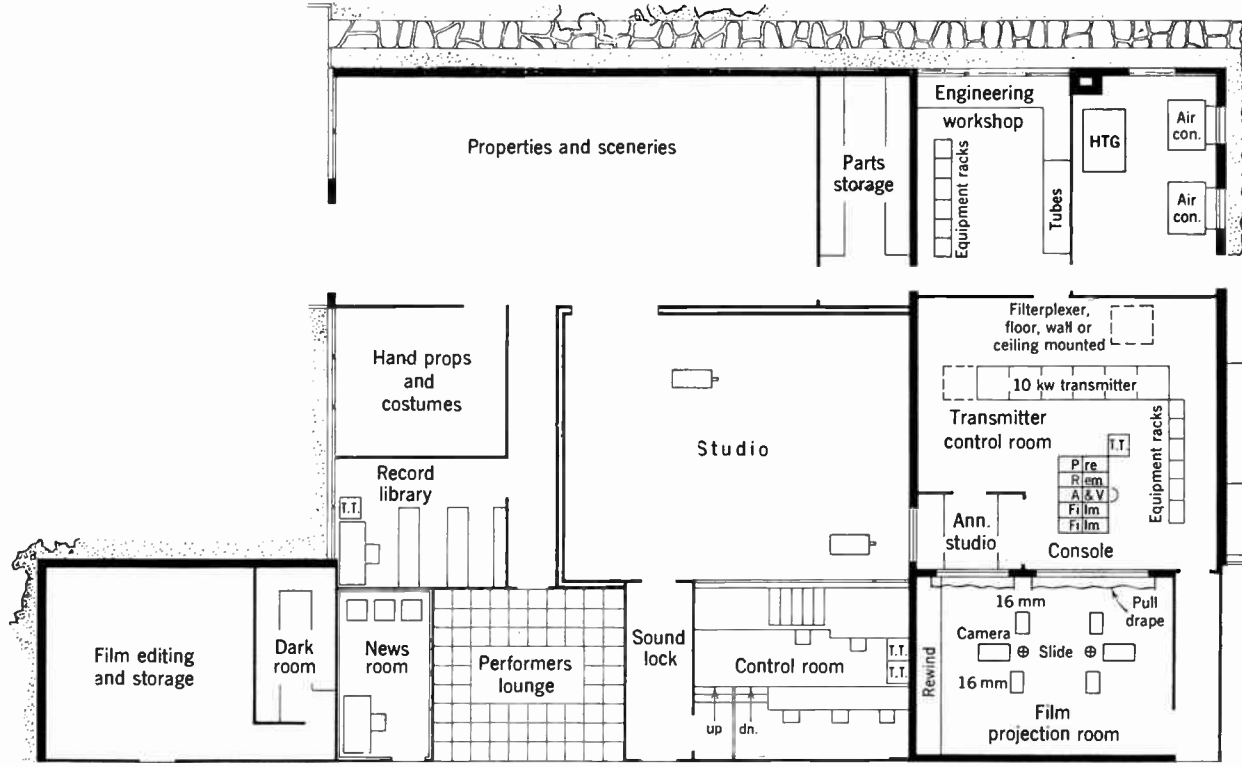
Typical Floor Plan of Group B Television Station. (Anderson and Hadlock, reference 2.)
